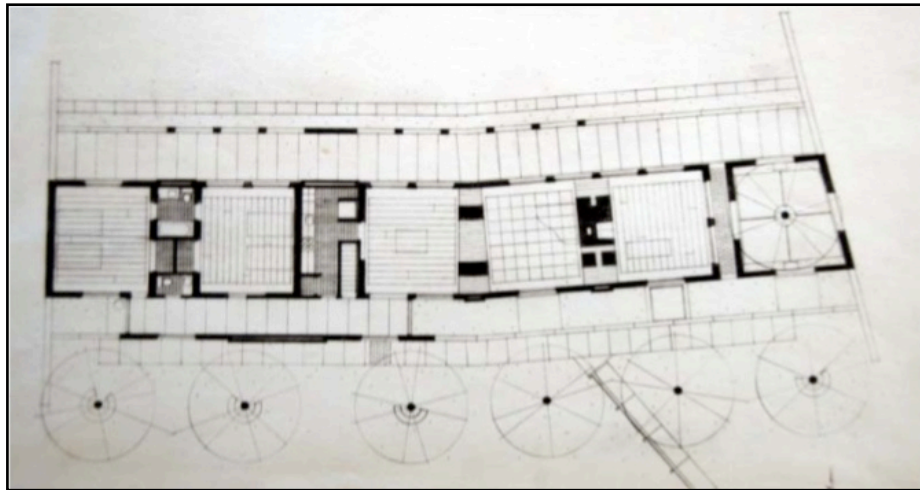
Robert Venturi, Pearson House, first floor plan. 1957 (Rodell, S, May 2008, p.15)
